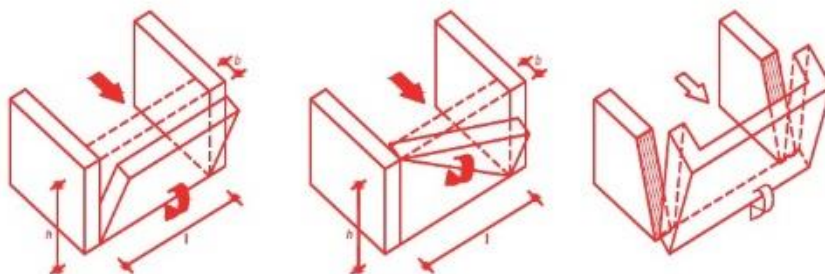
Failure mechanisms of the facade walls (GERMHS, 2017)
